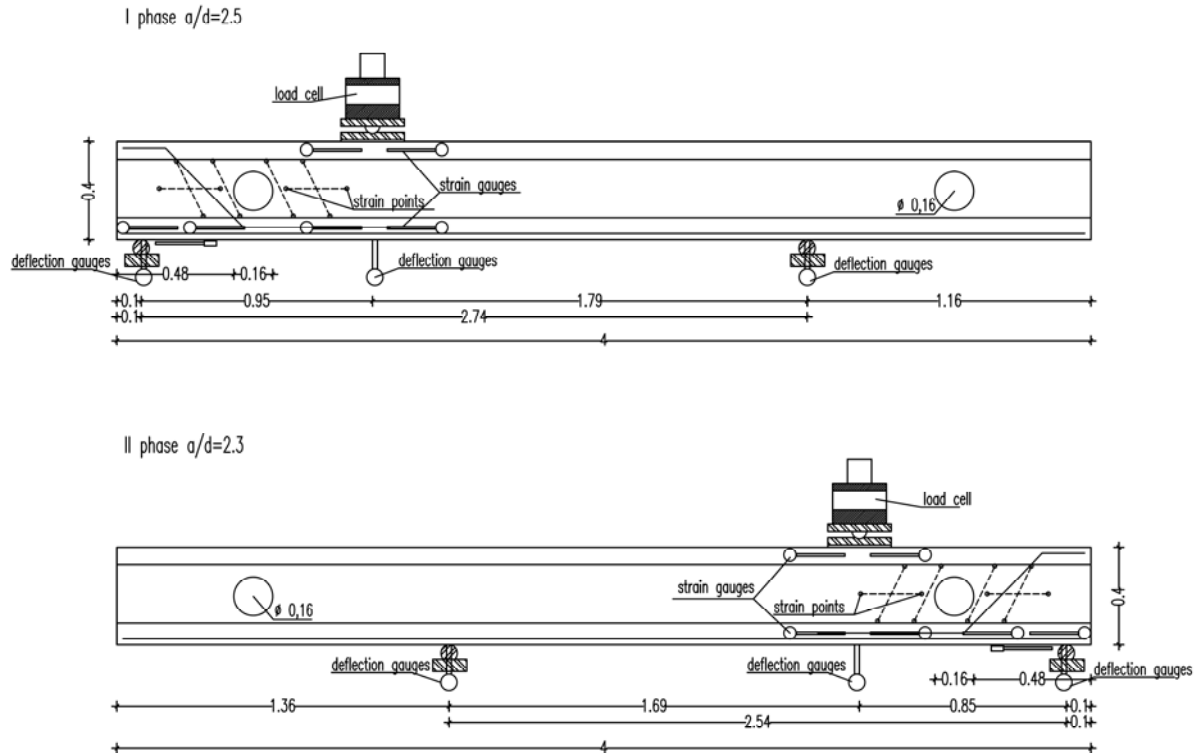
Test scheme and instrumentation of the beams (dimensions in m)
